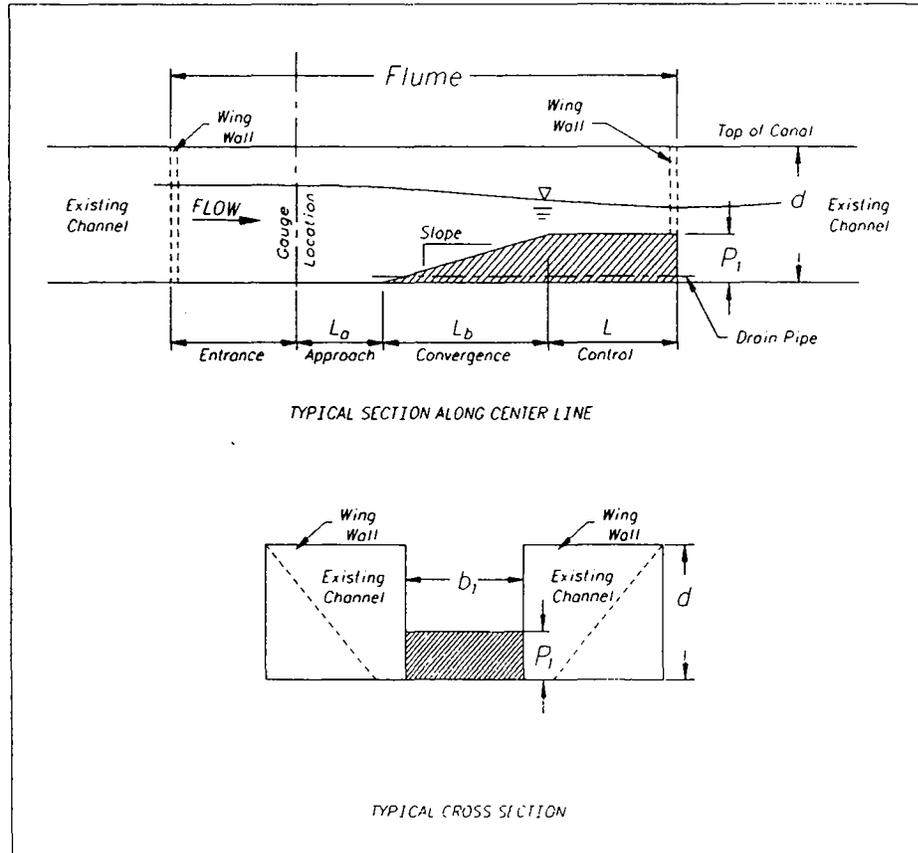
Typical sections of the flumes to be constructed for sites #4, 4a, and 5.
